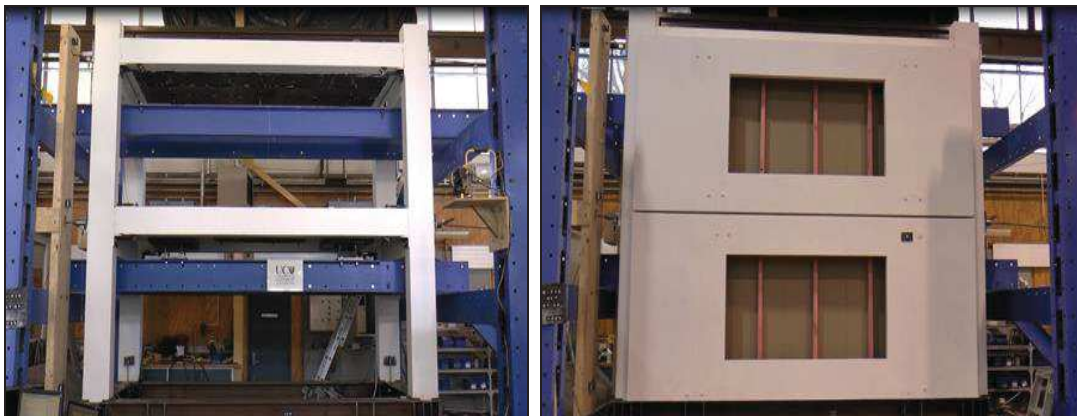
Test Building by Johnston et al. (2014): PRESSS Bare Frame (left) and complete structural & non-structural system with low-damage partitions and facades (right).
